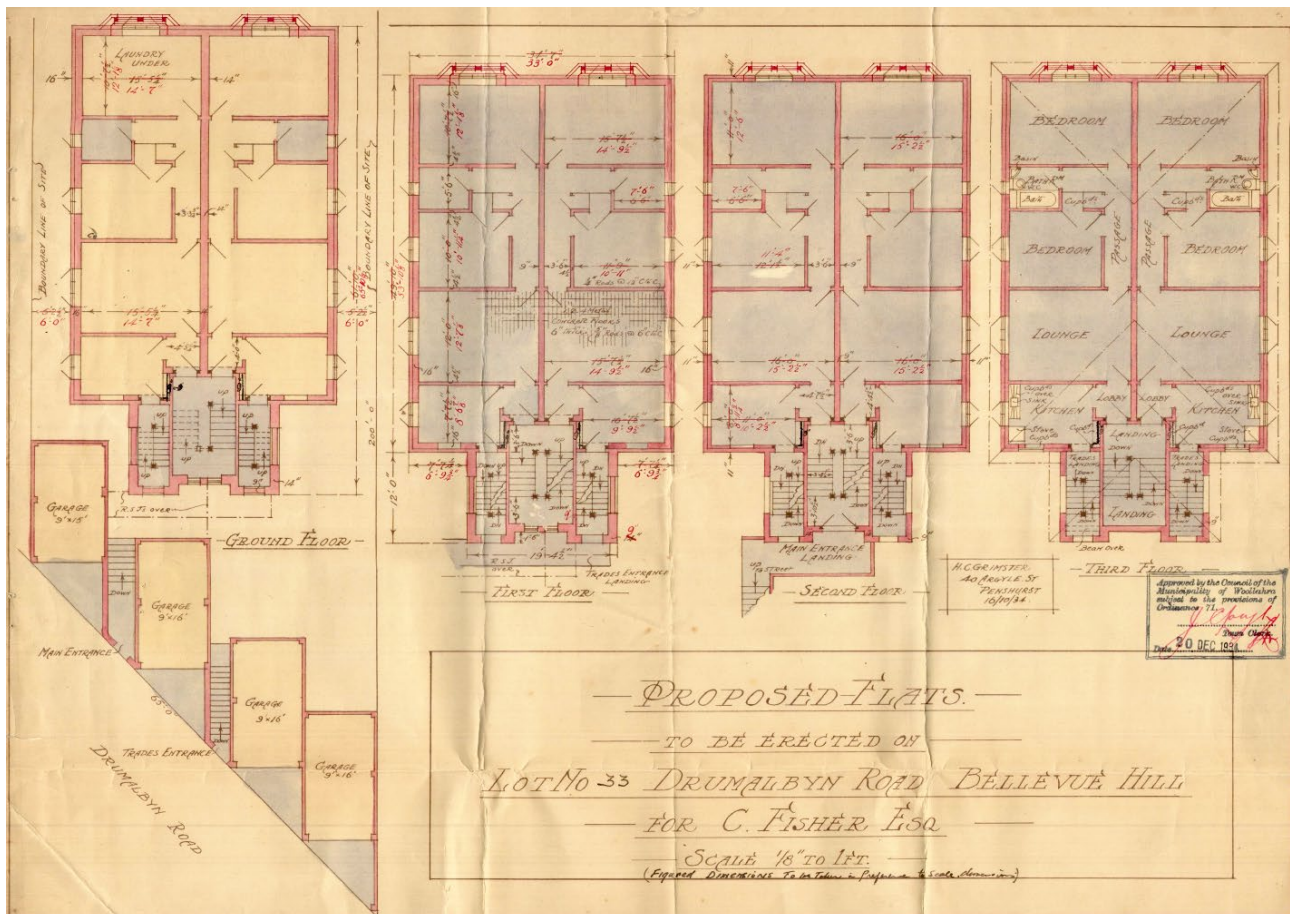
The building plan by Grimster is, however, similar to the layout and planning of the final building. It seems likely that expense was spared on Grimster's proposed fine details, or perhaps simply a change of taste.
